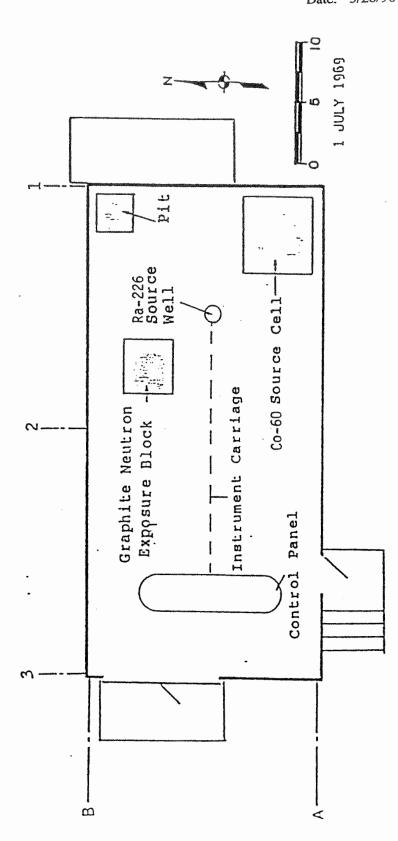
Plot Plan of the Radiation Measurements Facility, Building T029
